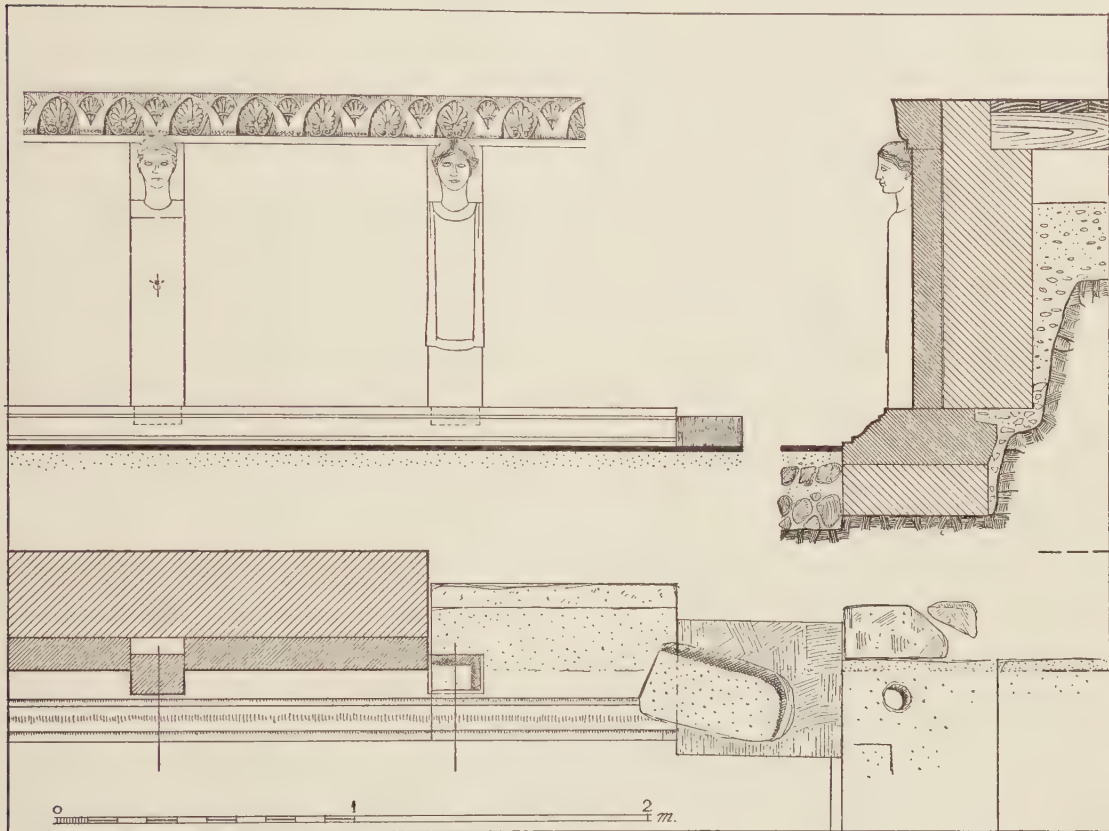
Stage Front: Plan of Actual State, Restored Elevation and Section
